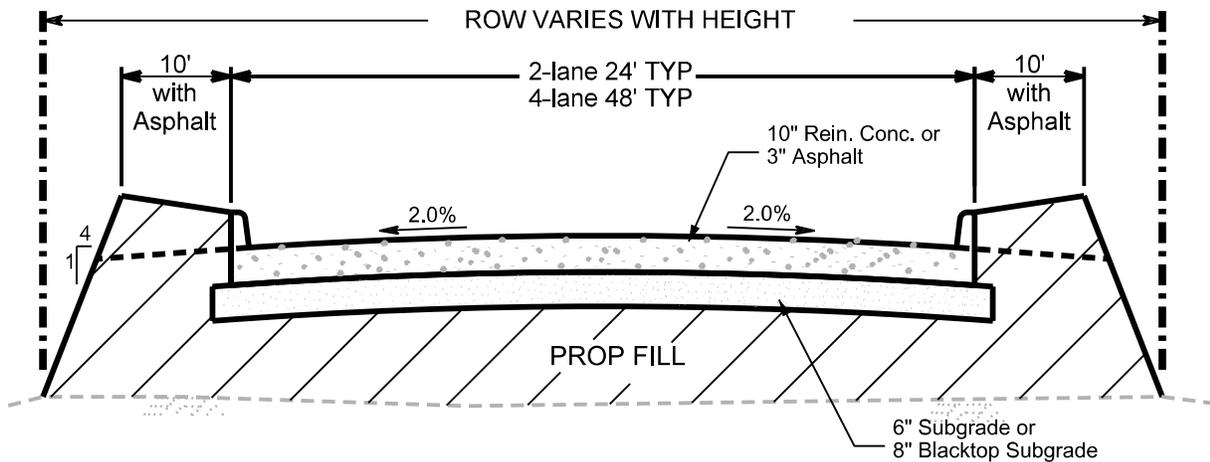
Typical roadway cross section for concrete and asphalt pavement sections
